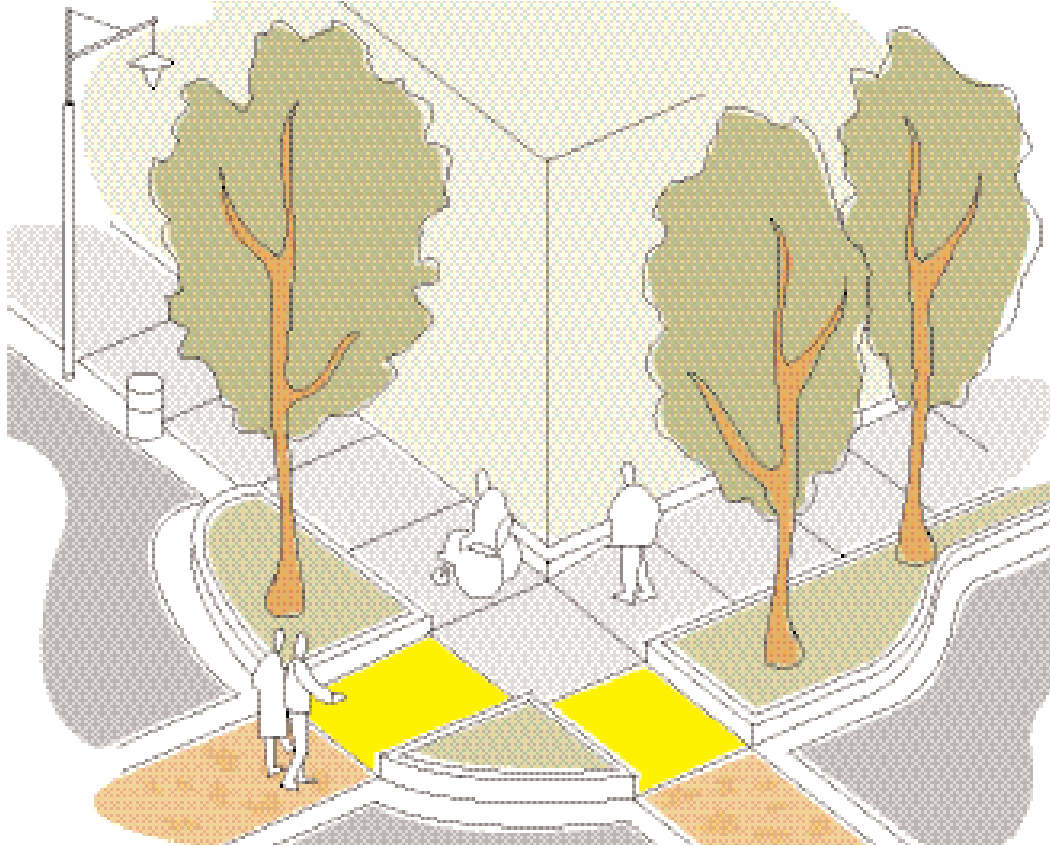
Bulb-outs at corners slow traffic and help pedestrians cross streets safely. Decorative crosswalks extend the sidewalk experience into the street.
